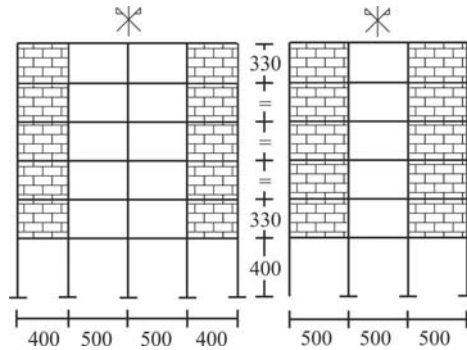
Soft first storey frames (IF\_SS(1) building) after the change in use (dimensions in cm)
